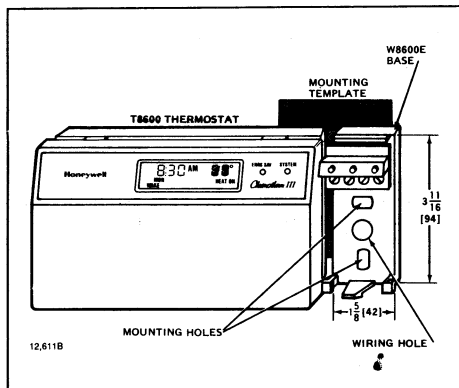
Mounting the W8600E Indicator next to the T8600 Thermostat, dimensions in in. [mm].
